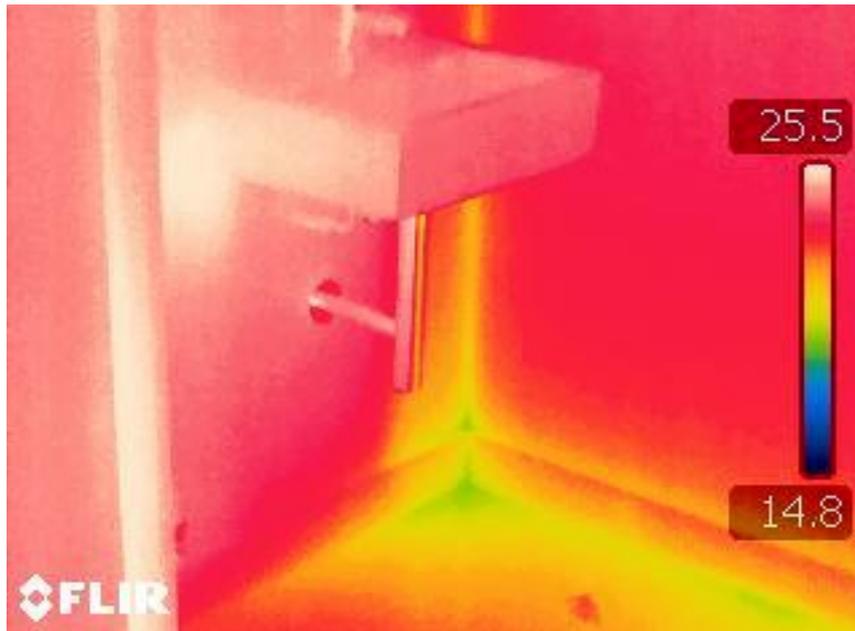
Floor to Wall Corner Phase 2 Heat Loss
